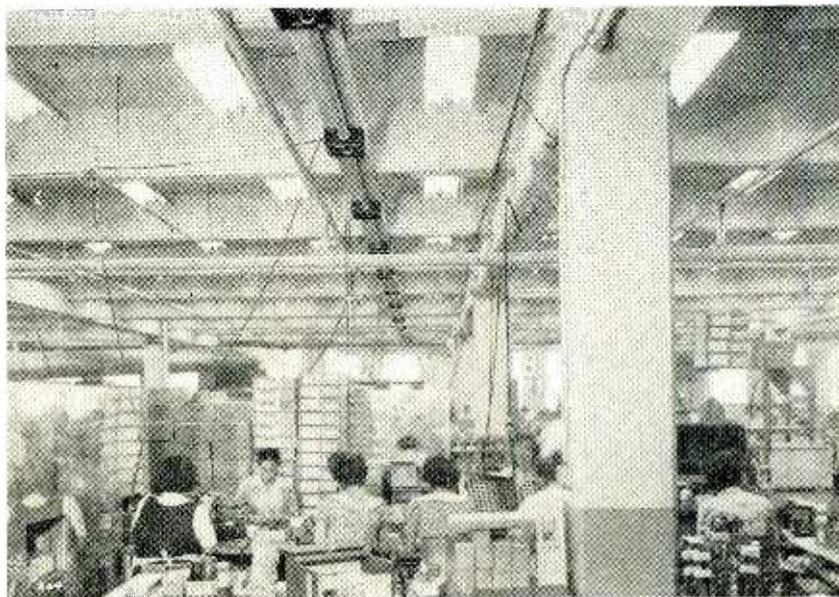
Conduit and J boxes are mounted on the ceiling of the plant
